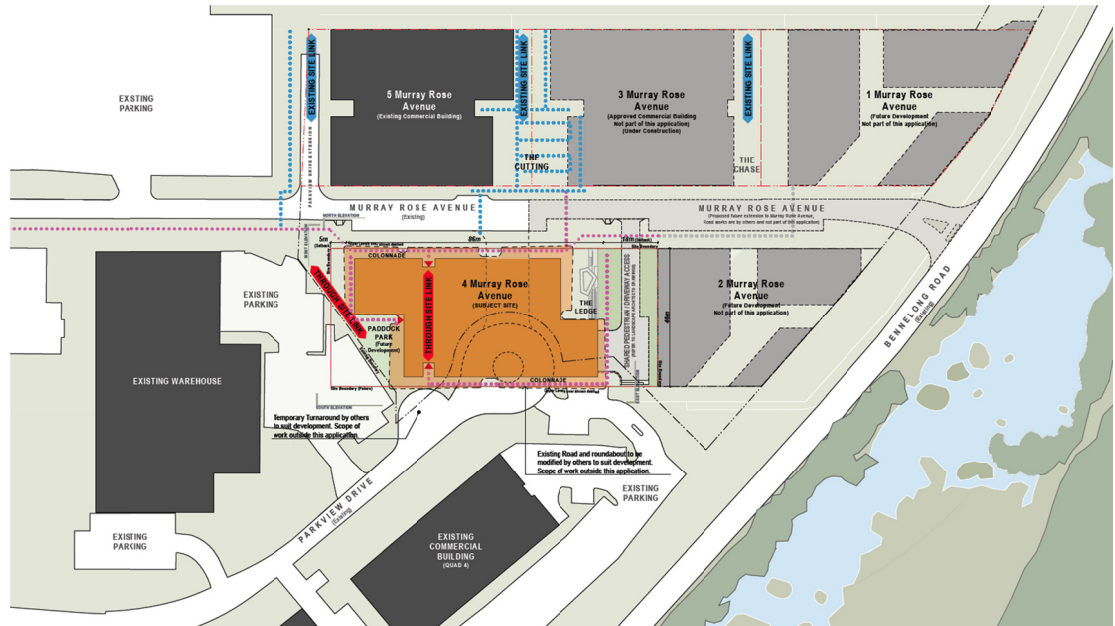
4 Murray Rose Avenue Master Plan – Day 1
